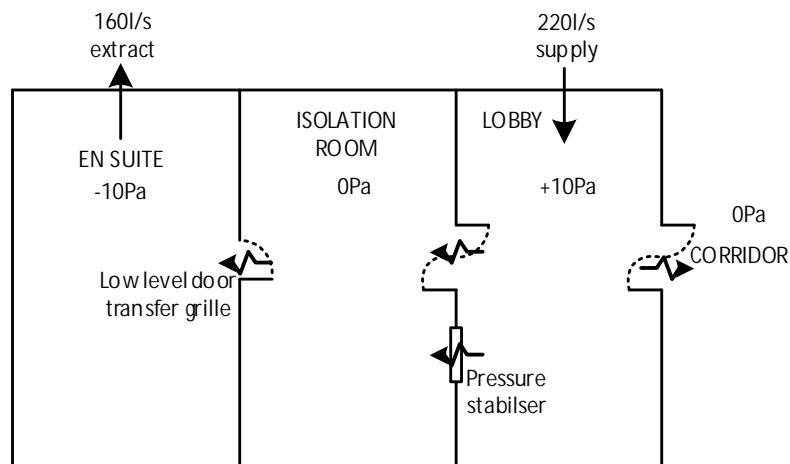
Positively Pressurised Ventilation Lobby, Neutral pressure isolation room
